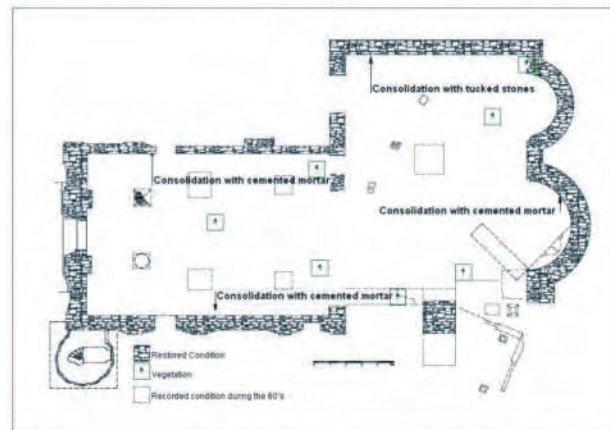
Planimetric plan of the cathedral showing the consolidated walls in 2008. Drawn by Arch. B. Keka.
